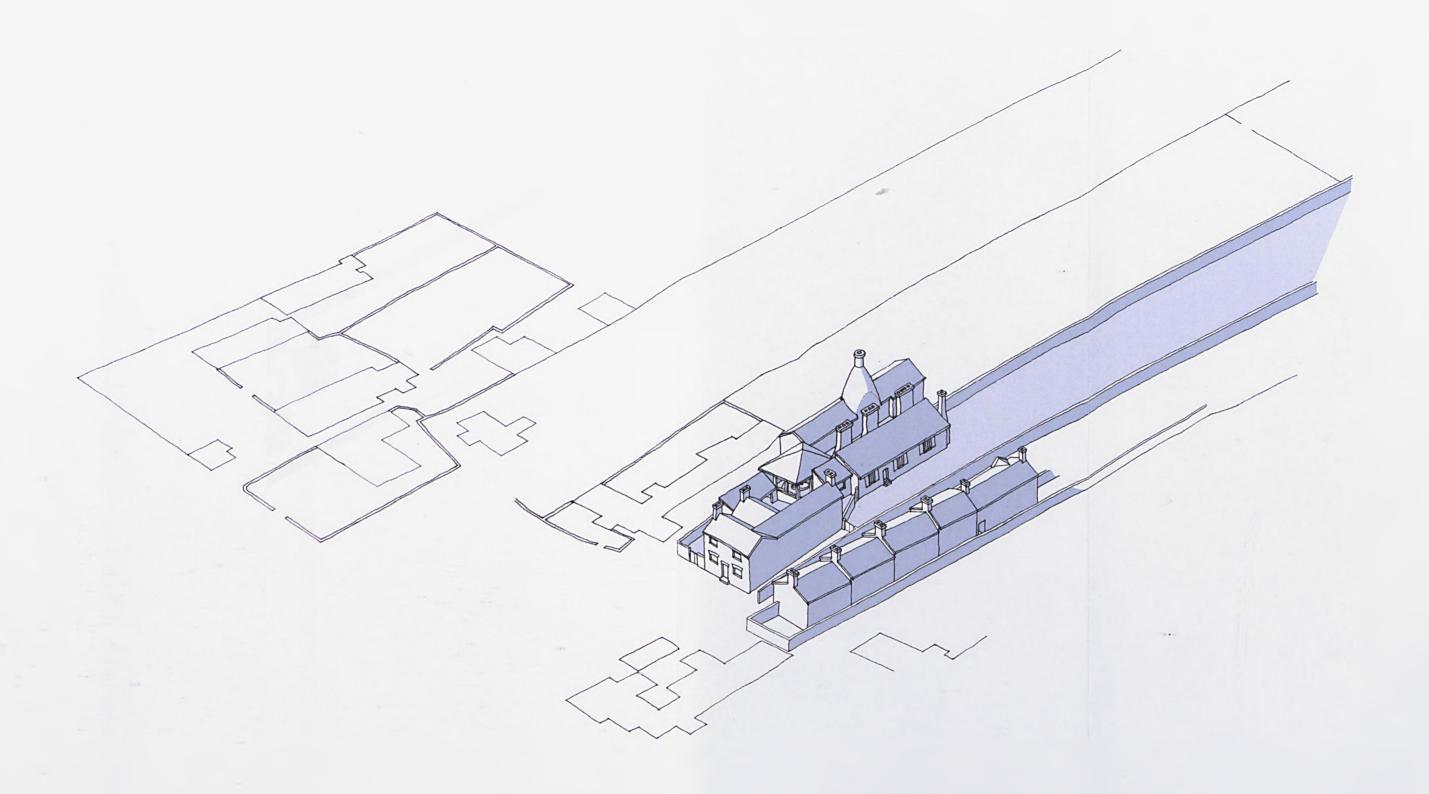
Isometric reconstruction of Huntsman's extended steelworks in 1781. Scale 1:500 (author).
